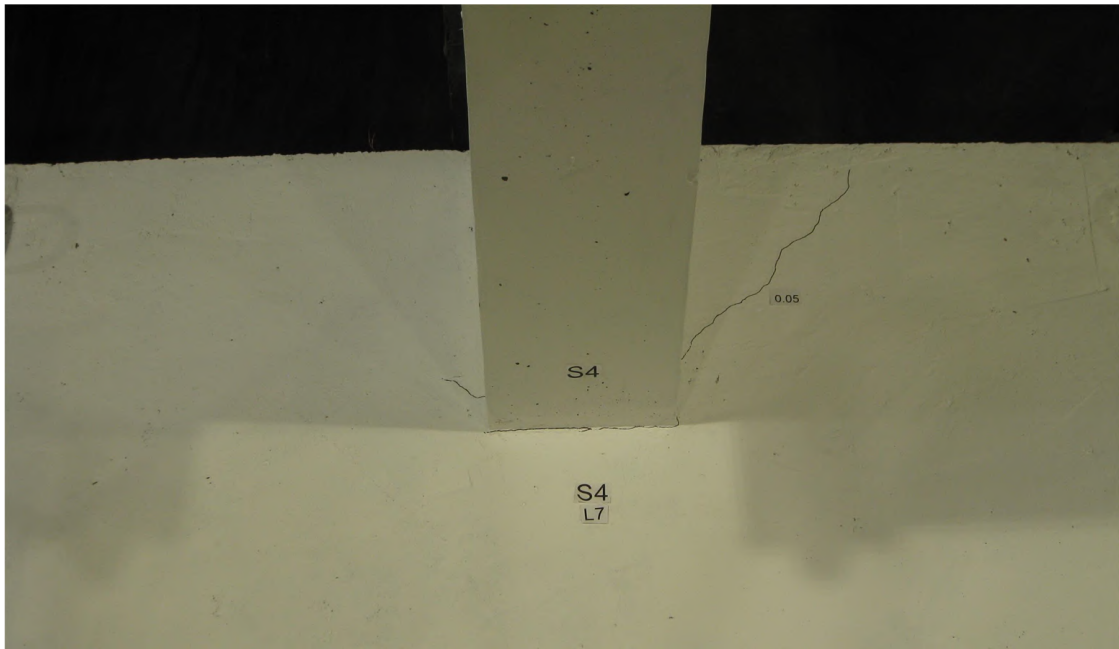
Specimen 4 slab cracks at $V = 86.0$ kN
